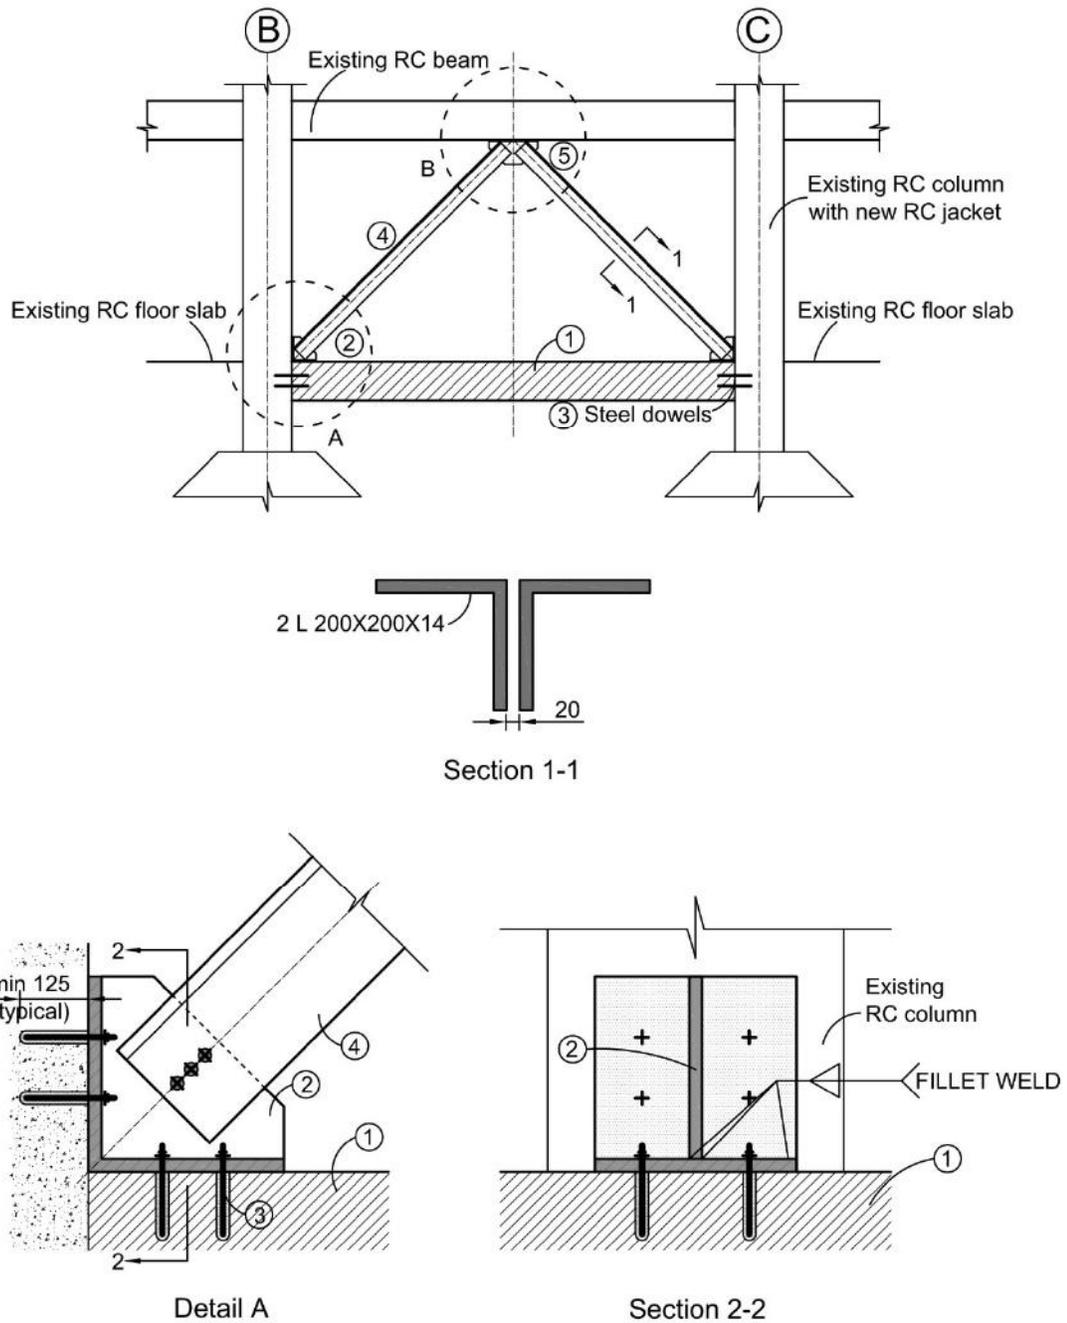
Construction details for a RC frame retrofitted with Chevron steel braces (RS2): 1-new RC tie-beam; 2 – new steel gusset plate for the brace-to-column connection; 3 – steel anchors for brace-to-concrete connections (various locations); 4 – new double-angle steel braces; 5 – new steel gusset plate for the brace-to-beam connection.
